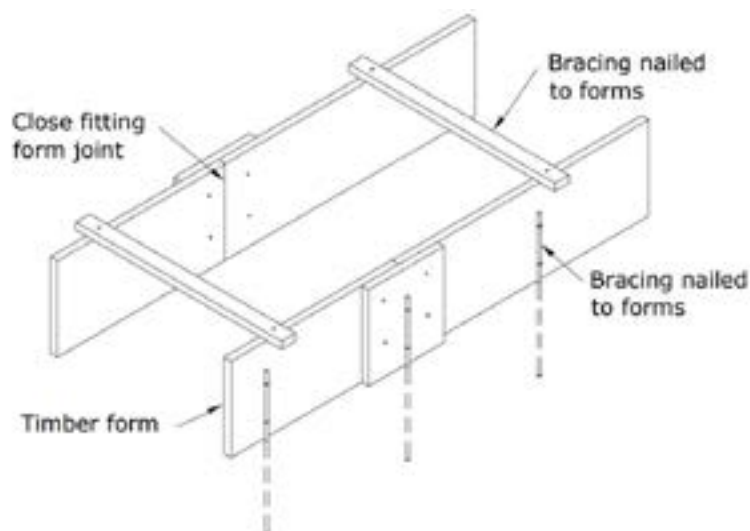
FORMWORK FOR STRIP FOOTINGS
